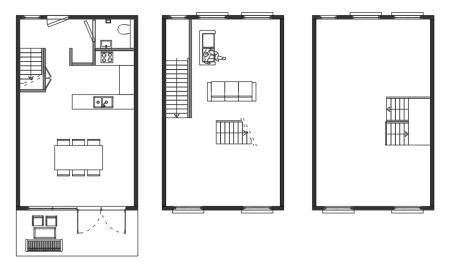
Floor plans of the initial phase of the 'Inner wall' outer shell' design strategy.
